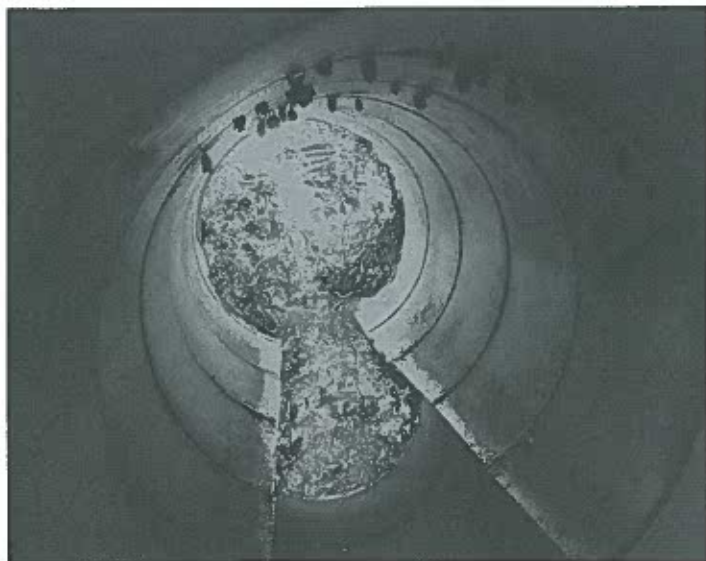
Bats hanging from the ceiling of a culvert. Photo credit to Merla Hübler
